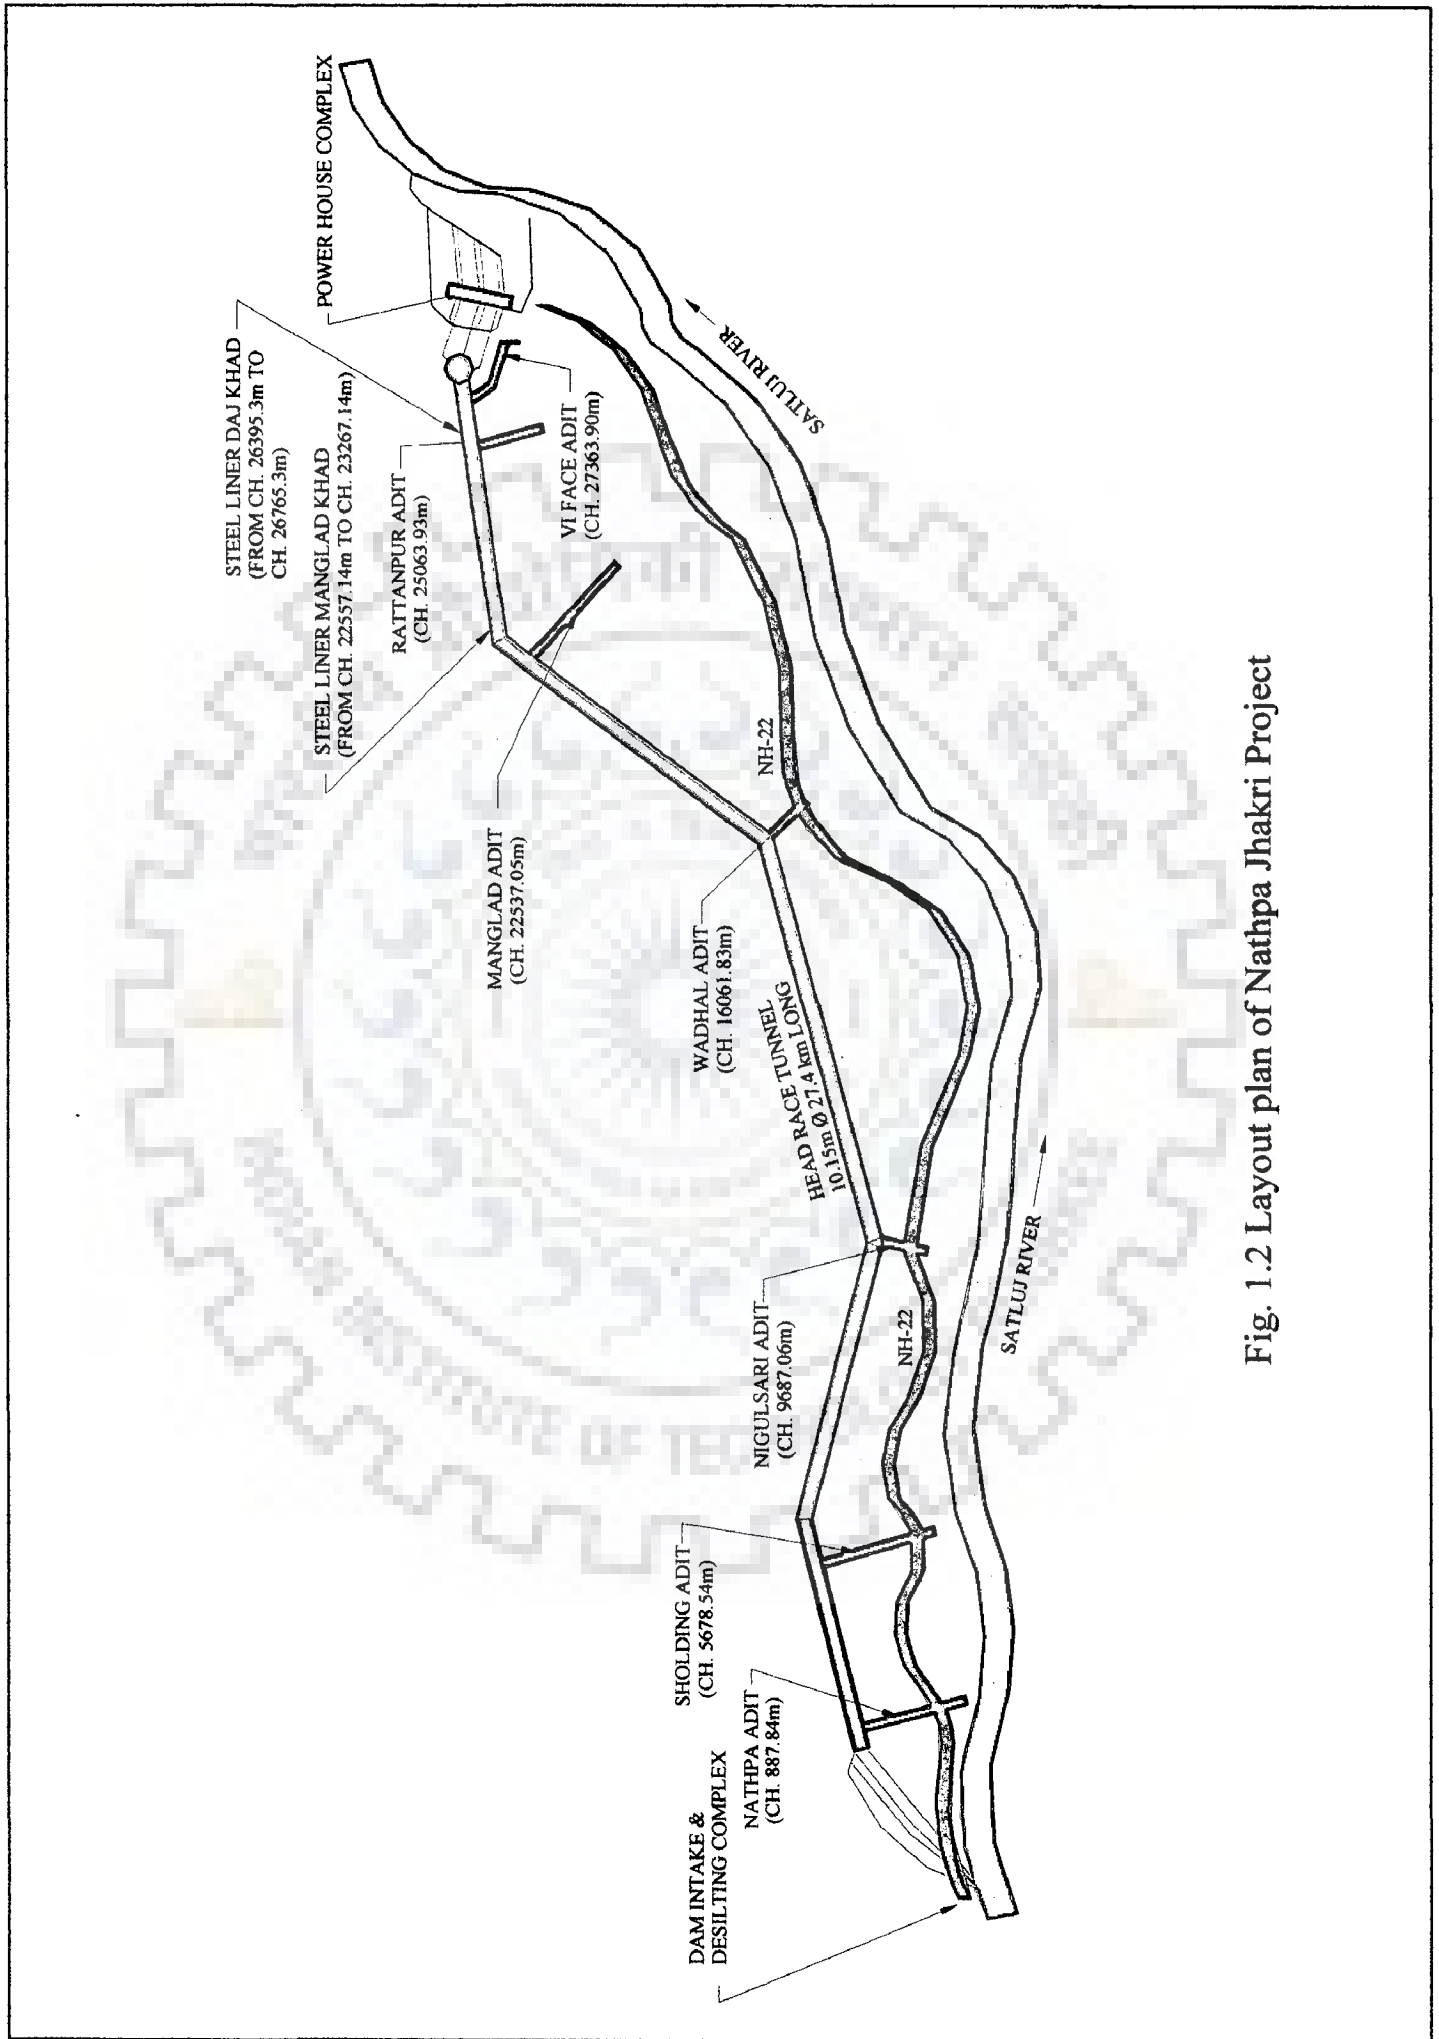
Layout plan of Nathpa Jhakri Project
